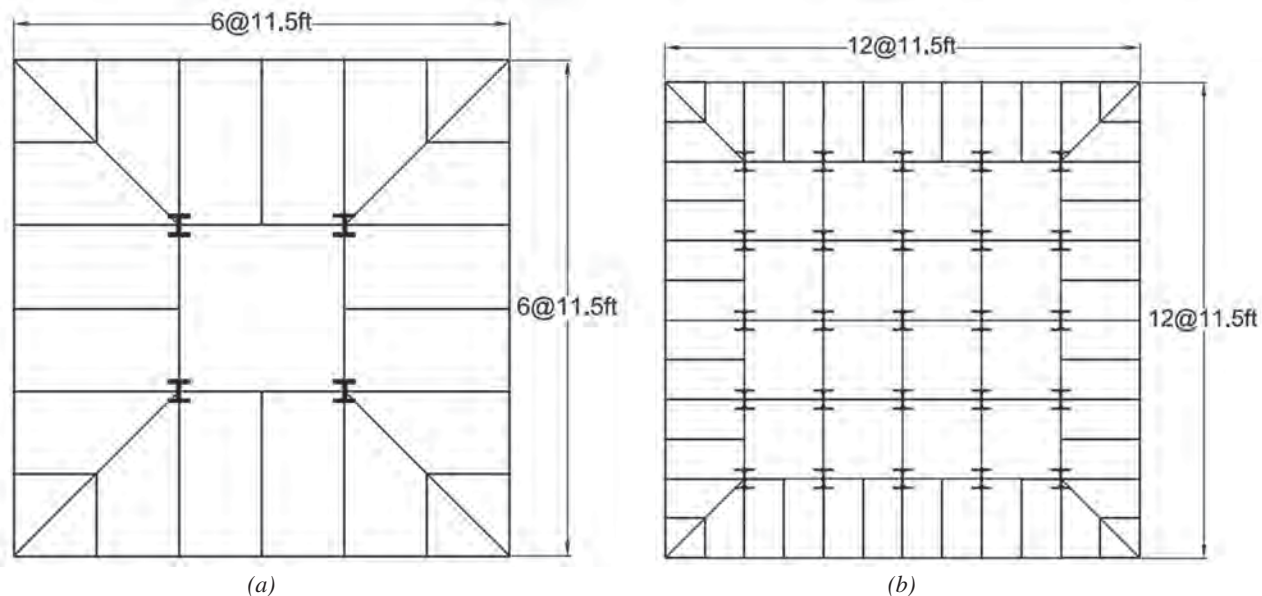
Typical floor plan for (a) 8- and 15-story buildings and (b) 30-story buildings.
